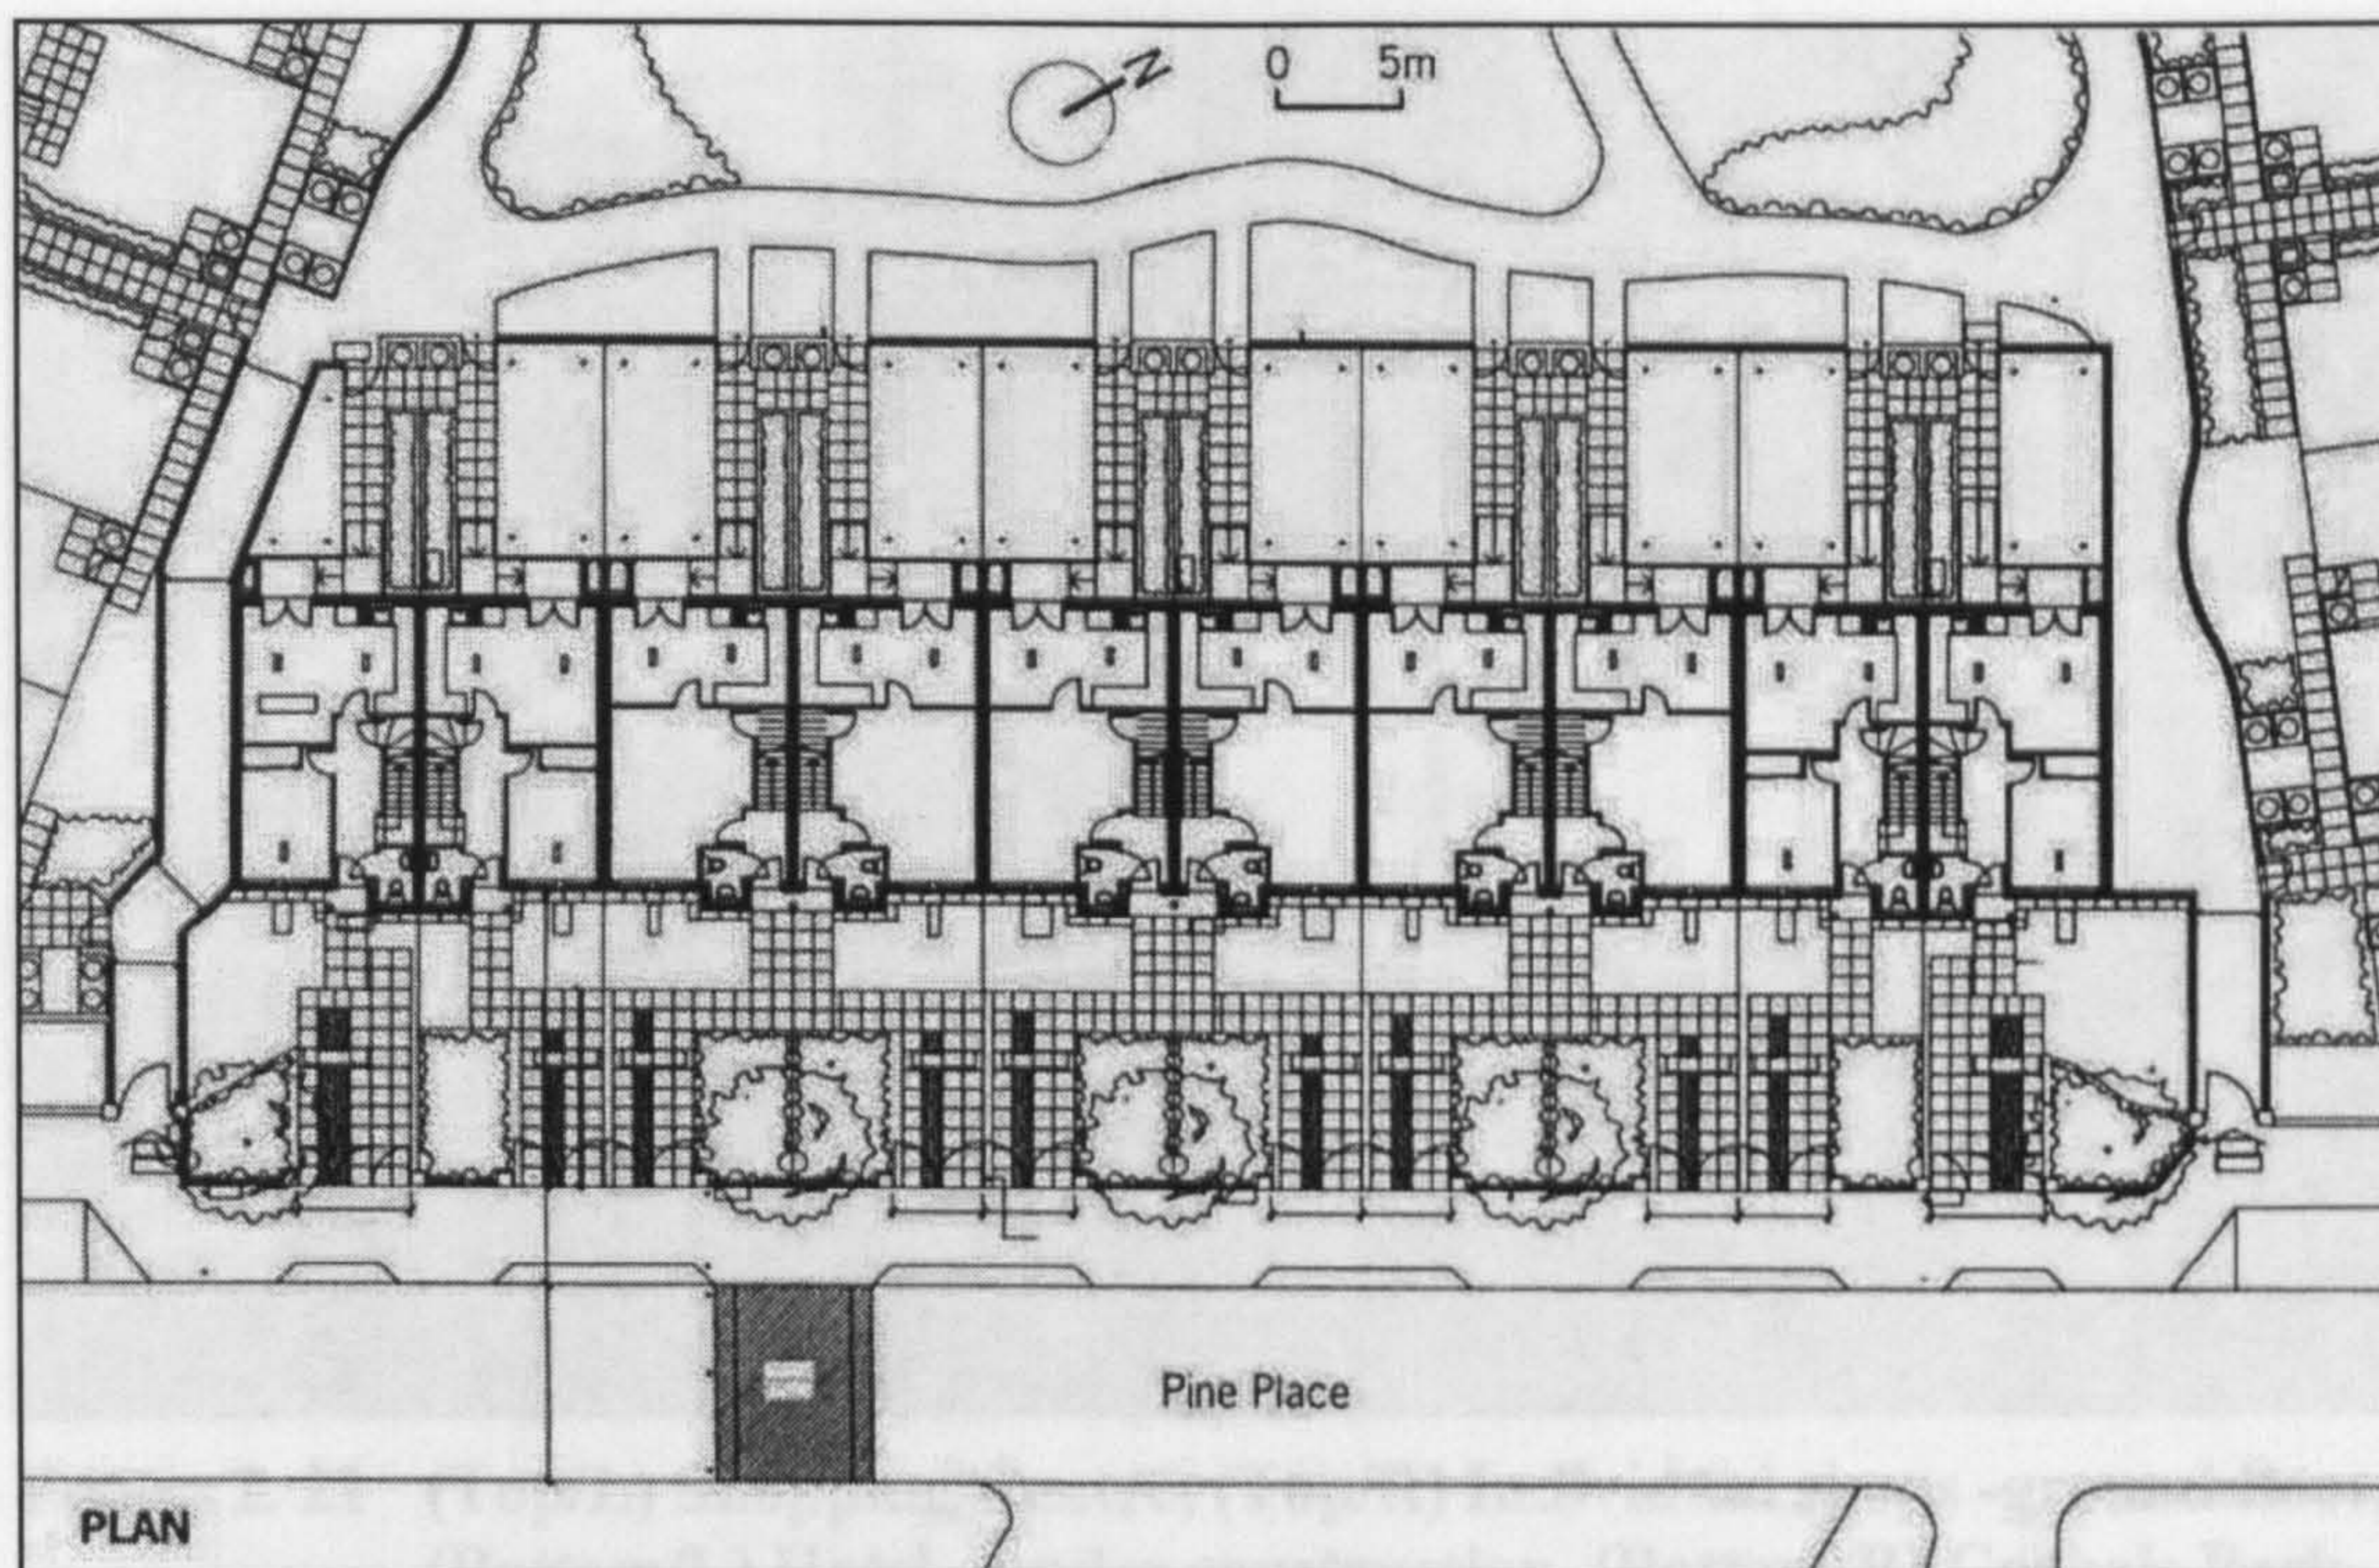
Ground floor plan of 2&3-floor terraced housing in Pine Place.
